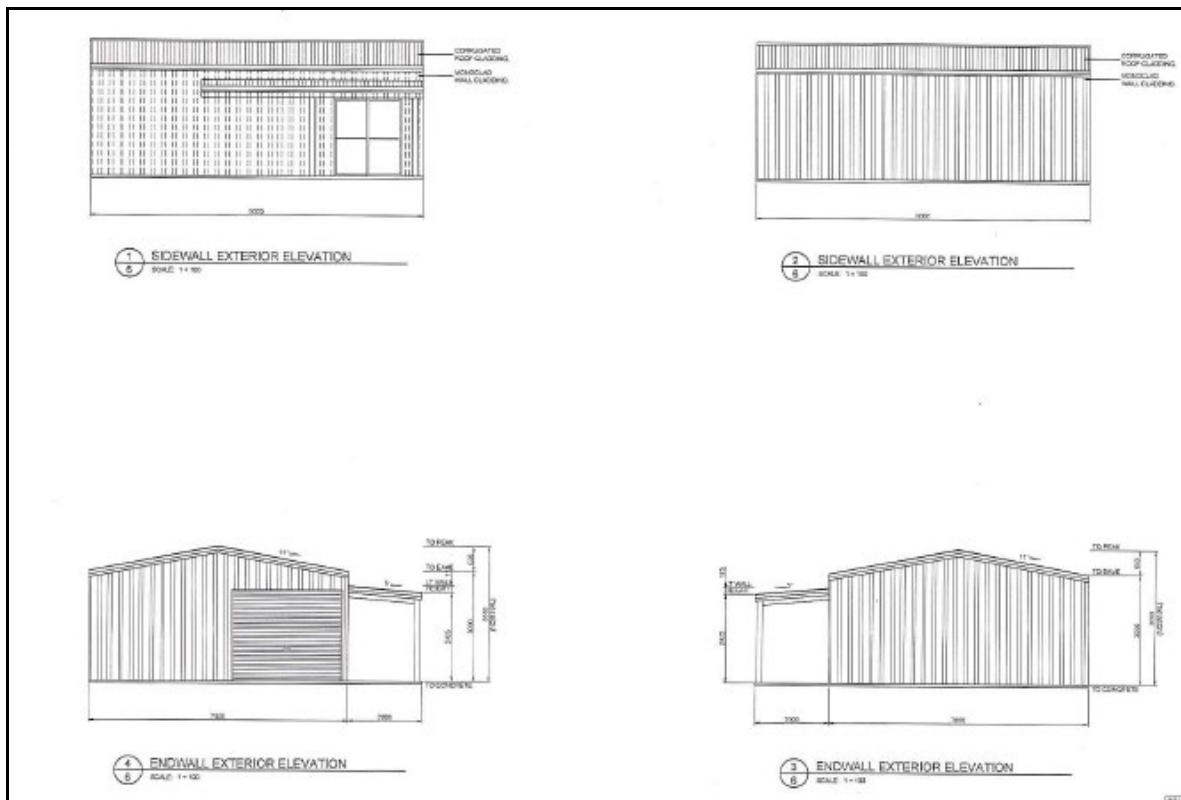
Proposed elevations (Skyline Roofing Pty Ltd, 2021).
